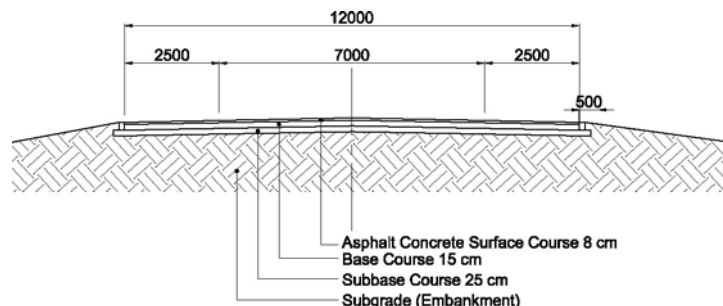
Typical Cross Section of sub-arterial road within the NR6 and the Ring Road
